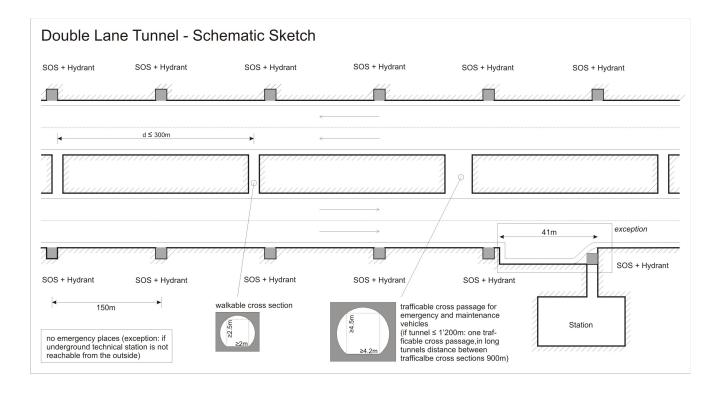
Rescue and escape facilities in double lane road tunnels
